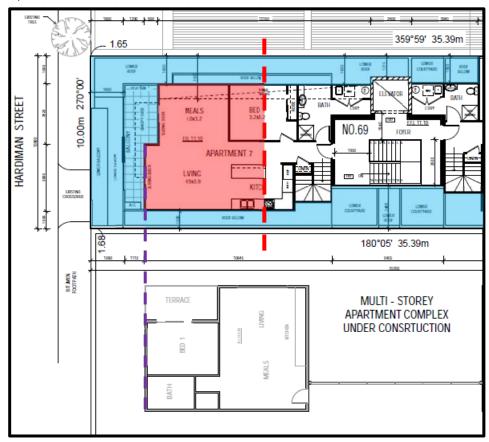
Notated excerpt from the 'Third Floor Plan' prepared by NRG Building Designs Pty Ltd
